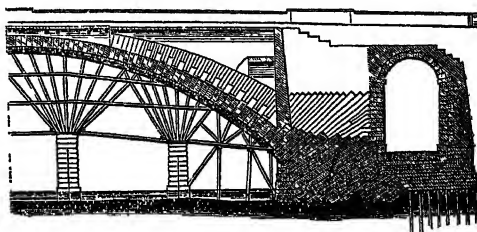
Centering of Grosvenor Bridge—Half Length.
